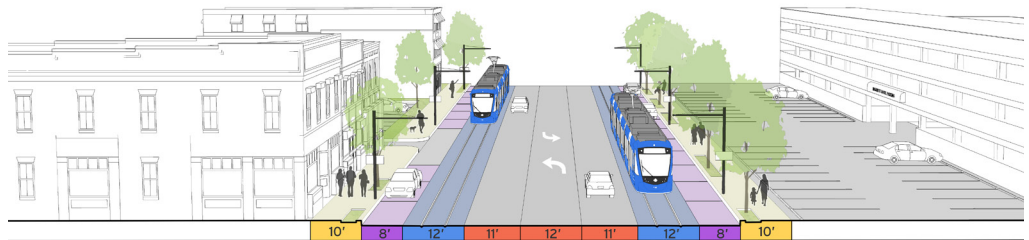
MAIN STREET NORTH OF LINWOOD BOULEVARD WITH STREETCAR IN MIXED TRAFFIC
